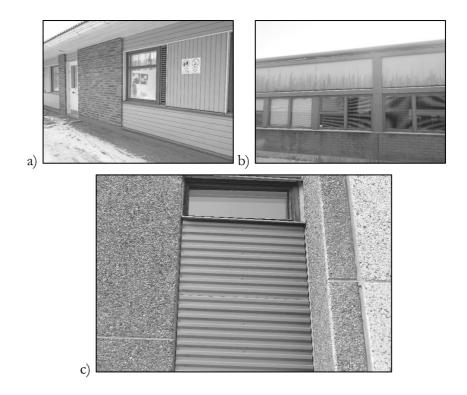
It is very common for façade material to vary in Finnish public buildings, especially around the windows. These examples include changes between a) masonry and wooden panels, b) masonry and a ventilated façade based on cement boards, and c) concrete and a ventilated façade based on metal panels.
